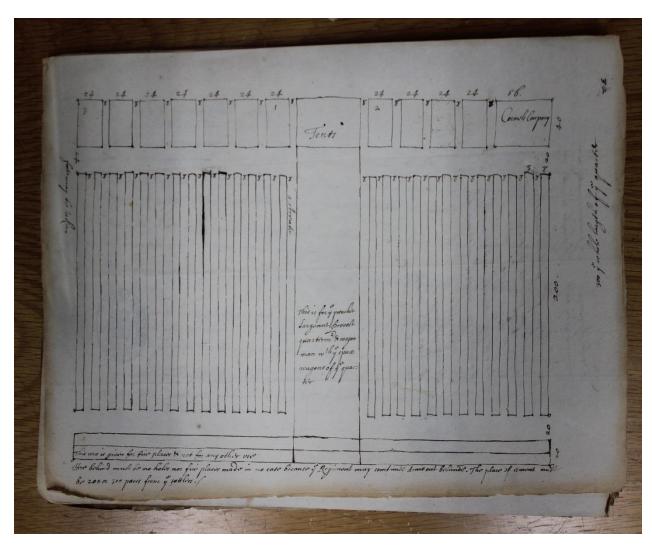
Typical Plan of the Layout of an Army camp as prescribed by Horace Vere. 1612
